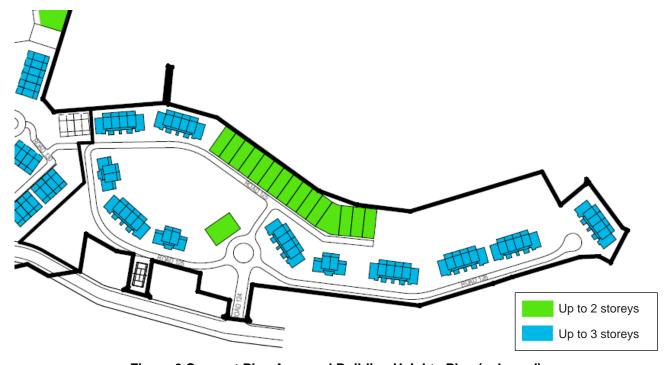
Concept Plan Approval Building Heights Plan (enlarged)
